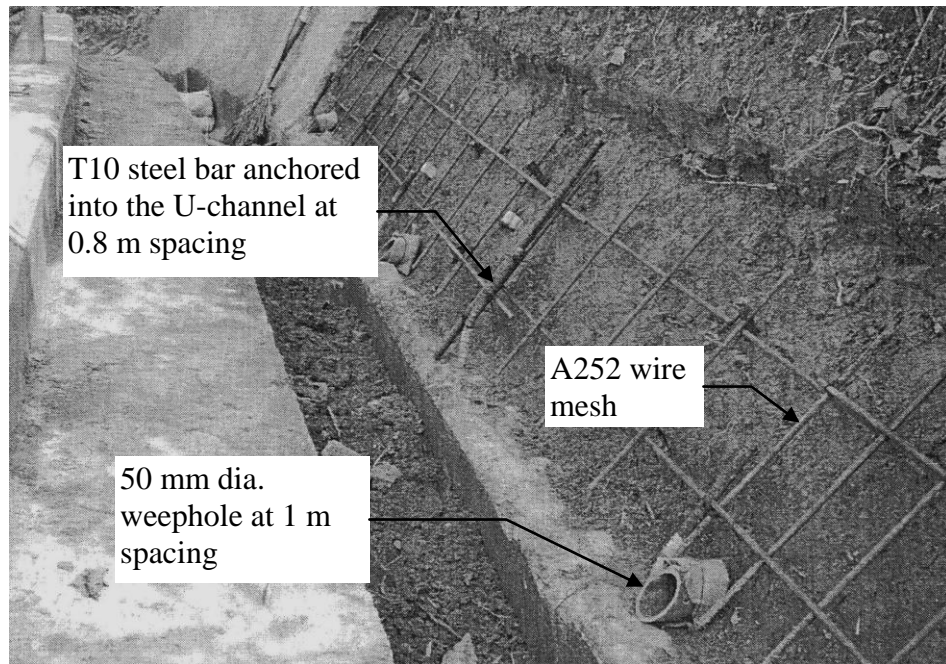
Repair of Cracked U-channel along the Crest of Slope No. 6NE-B/C44 Looking Southeast
